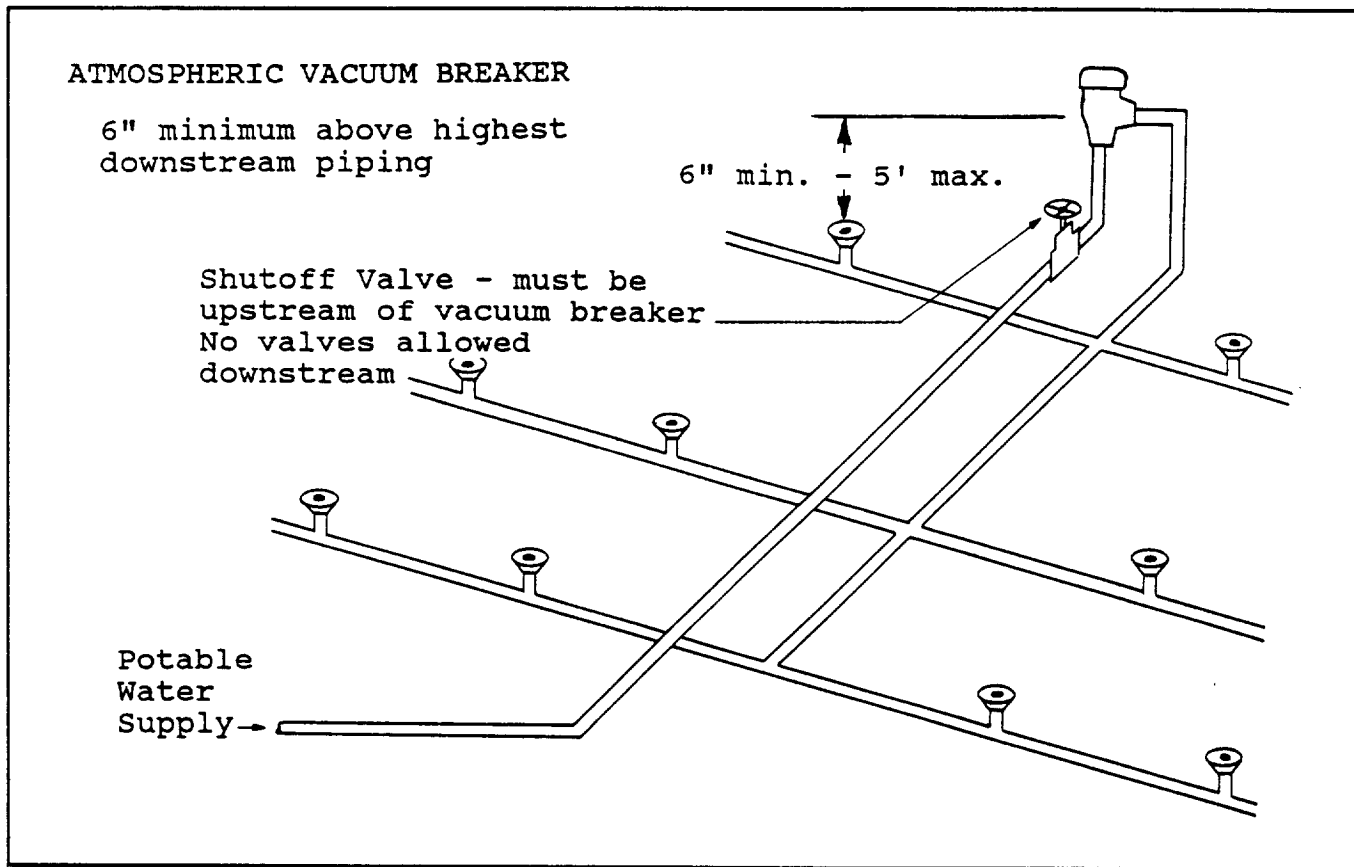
Hillside Irrigation System Using Atmospheric Vacuum Breaker.
